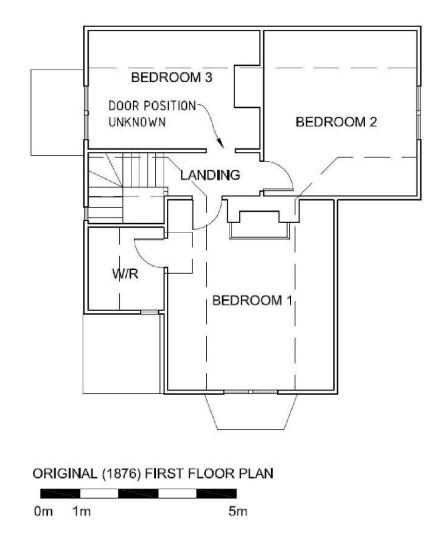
Vicarage building- probable first floor plan as at 1876 (image courtesy Chessa Stevens)
